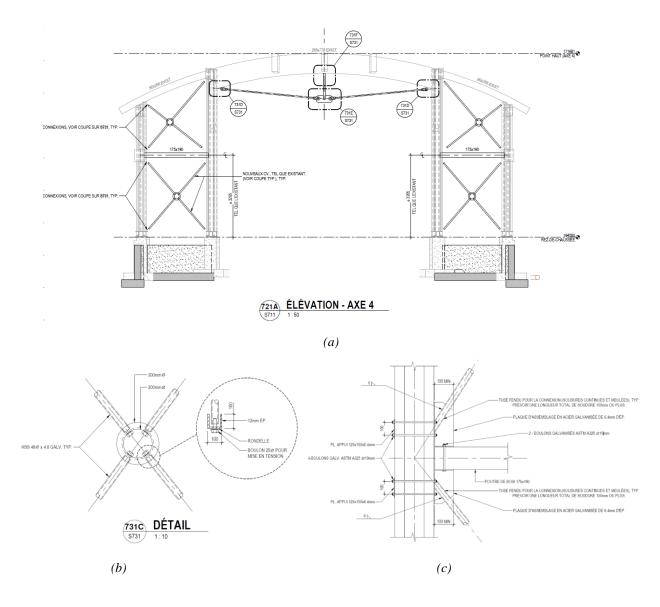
Detailed design and modelling of the connections (a) New vertical tension-only X bracings layout, (b) Steel rings, (c) New vertical tension-only X bracings center beam and column connection.
